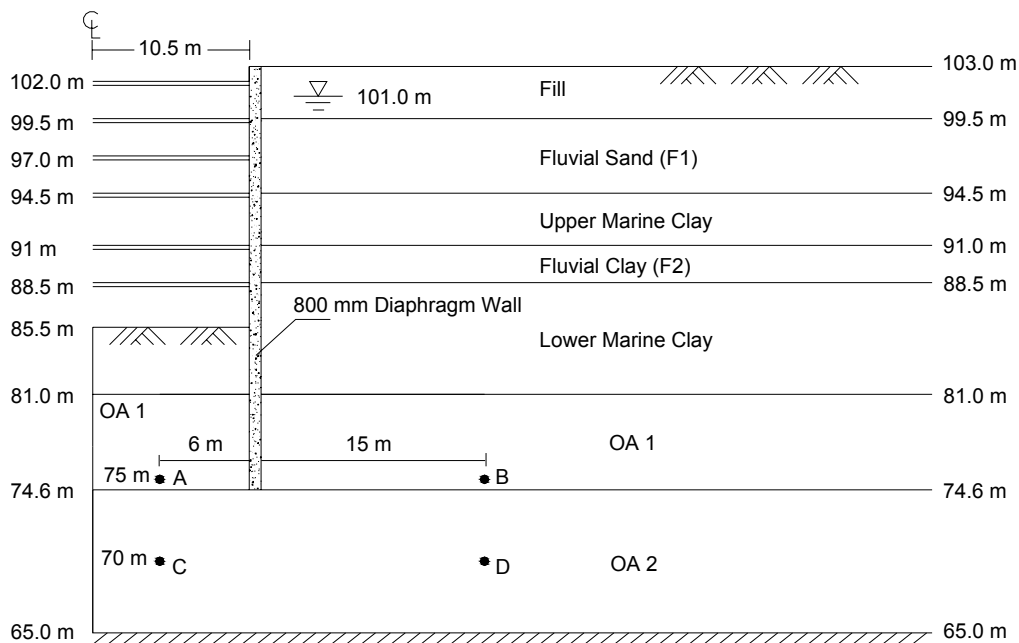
Cross-Section of Excavation at Farrer Park – Kandang Kerbau (CH 31+895) (Li, 2001)
